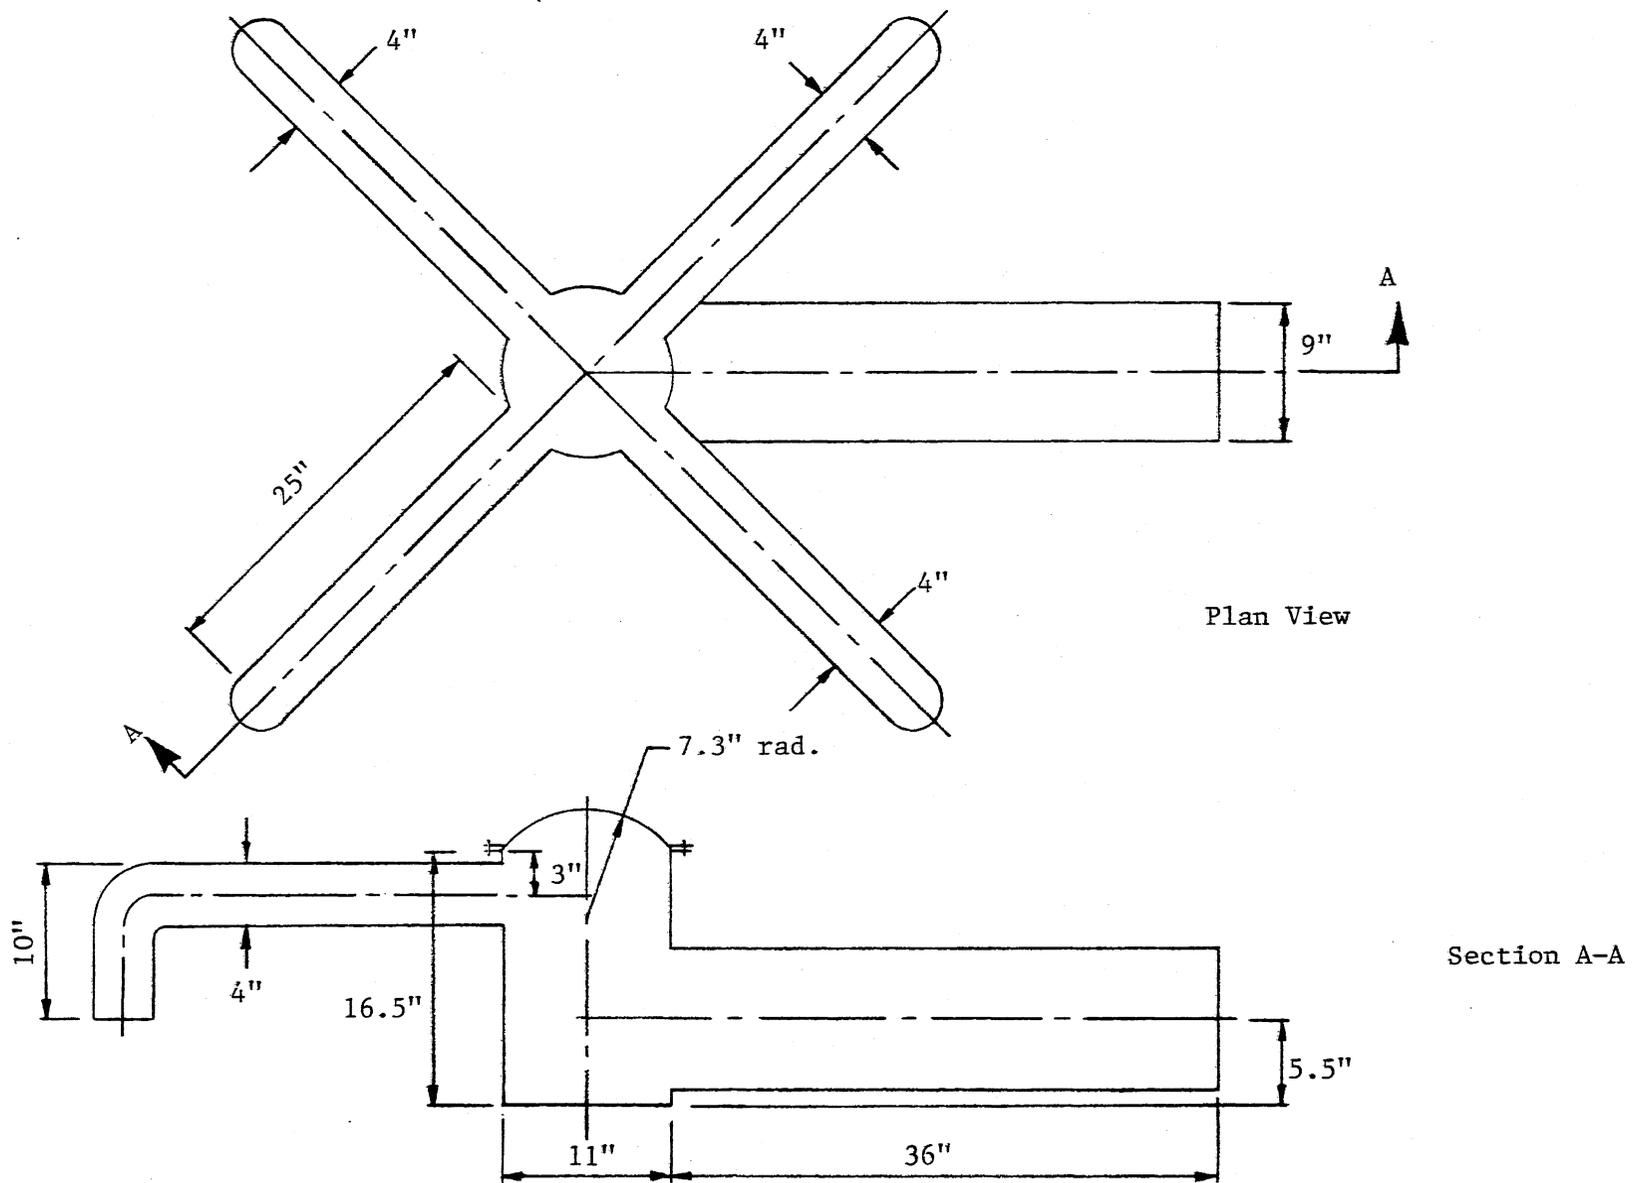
Collector Well Model Dimensions (Inside Dimensions in Inches).
